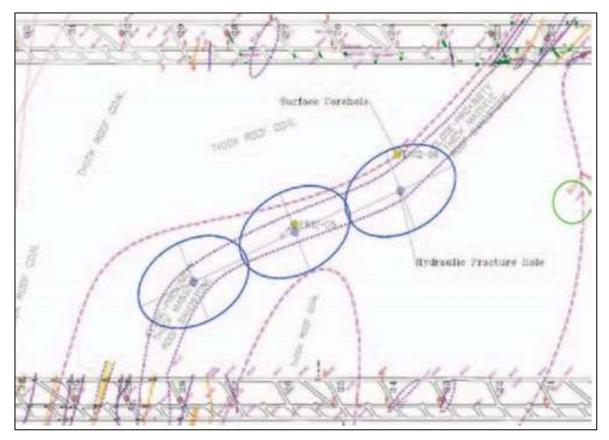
Enlow Fork sandstone paleochannel traversing longwall panels and hydrofractures (Lu et al, 2014)
